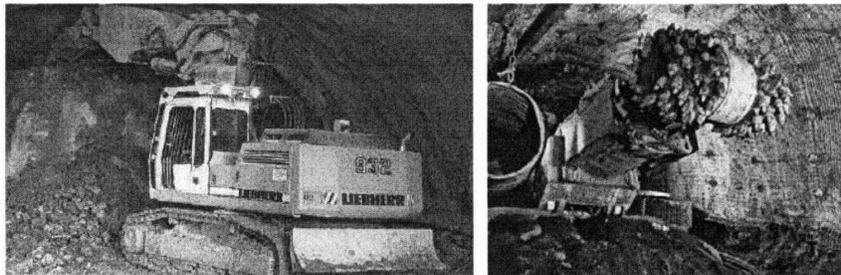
, Excavator (left); Roadheader (right), (Kolymbas 2005)
